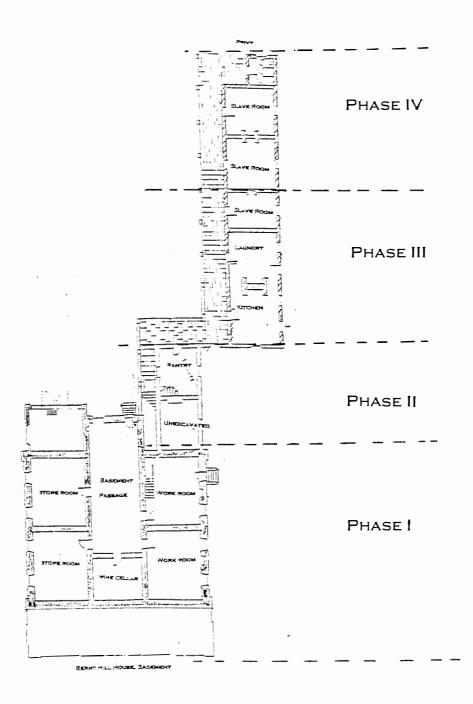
Berry Hill House. Plan showing four phases of construction.
